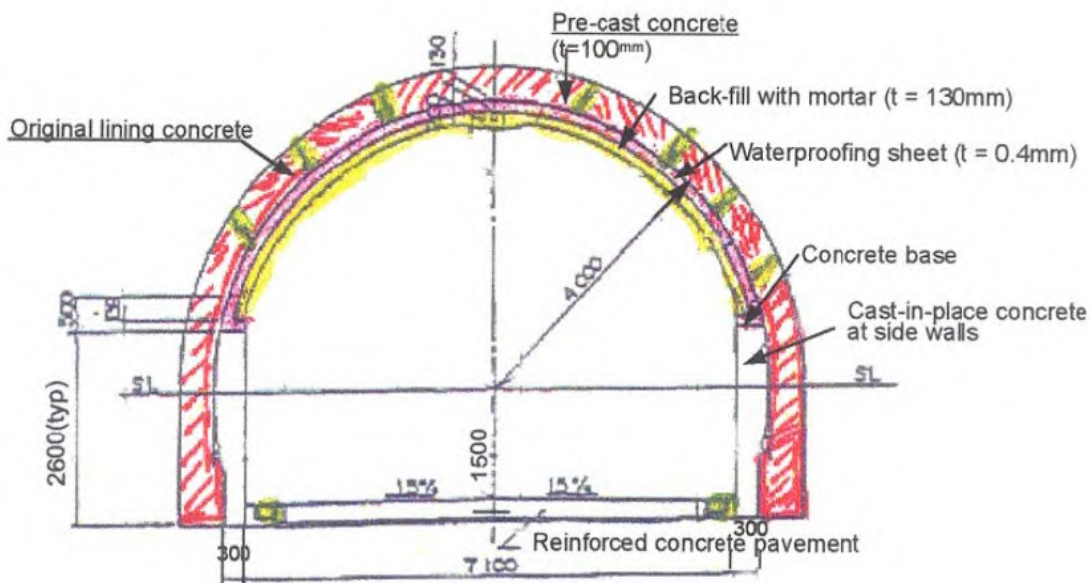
Sealing of leakage water on the interior concrete face by placing a waterproofing sheet and a protective reinforced mortar layer (Russell, 2001).
